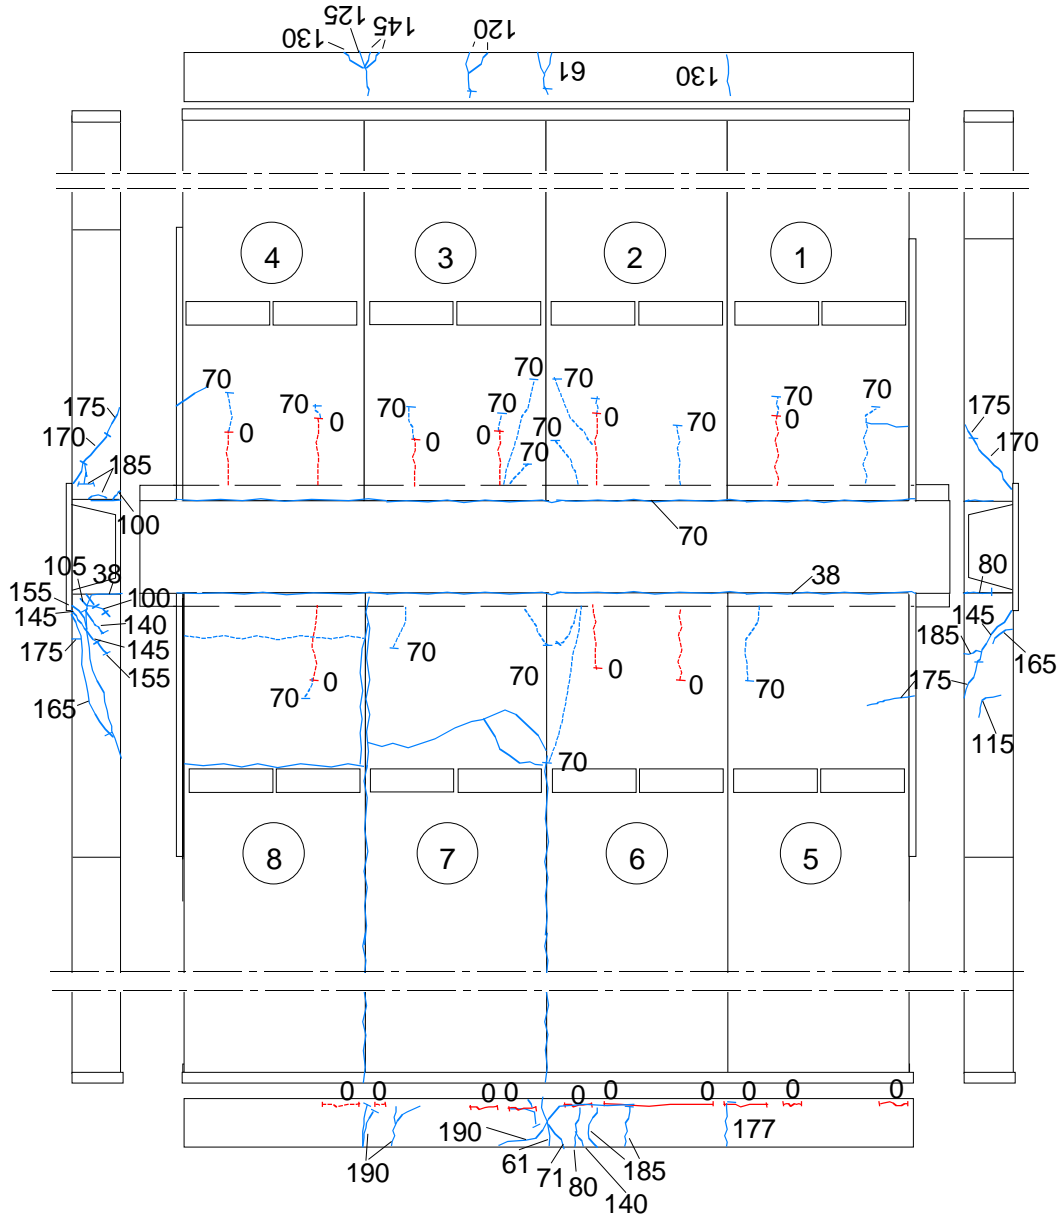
Cracking pattern after the failure. The dashed lines illustrate the cracks in the soffit.
